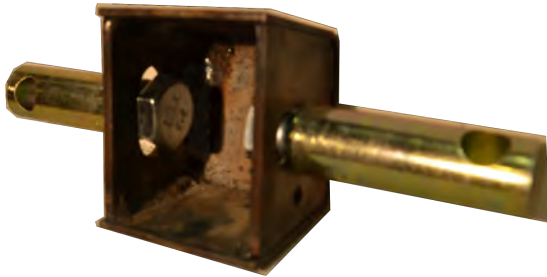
Vertical connection box showing attached lifting anchors embedded in concrete
